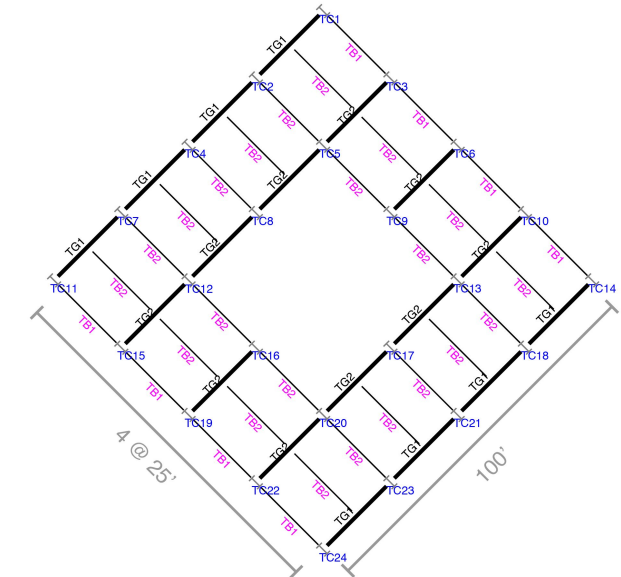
Typical floor framing at Tower Units 0 and 1.
